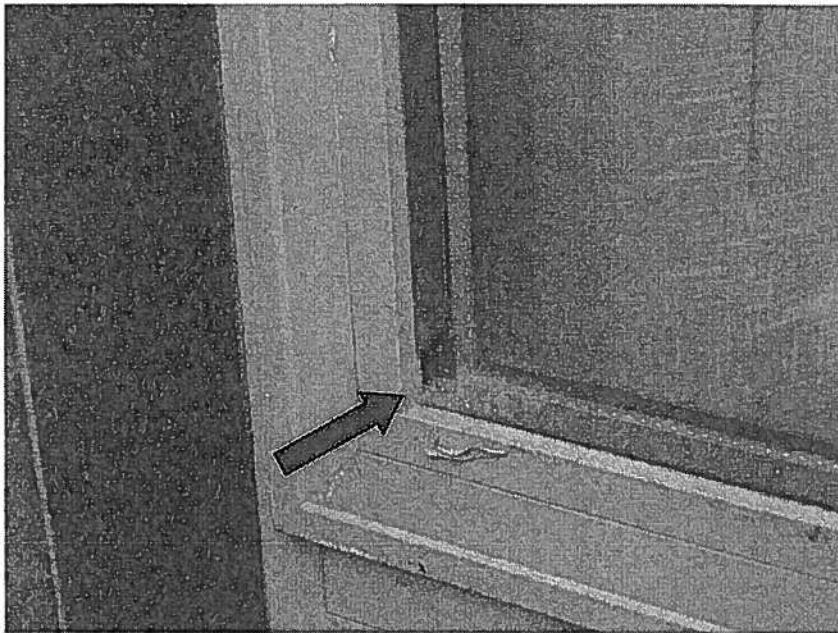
Typical open joint in rubber gasket allows excessive water into window assembly.
